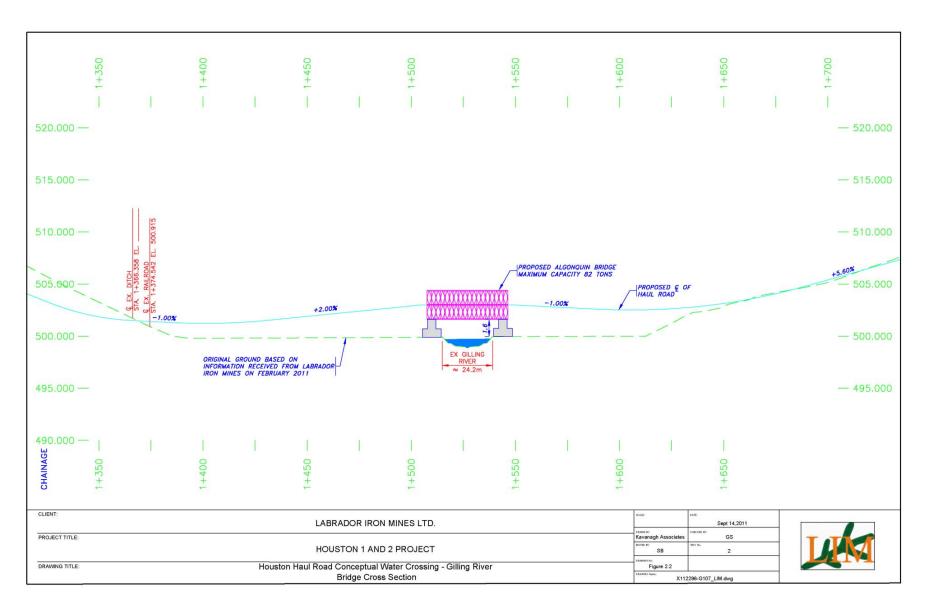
Houston Haul Road Conceptual Water Crossing - Gilling River Bridge Cross Section
